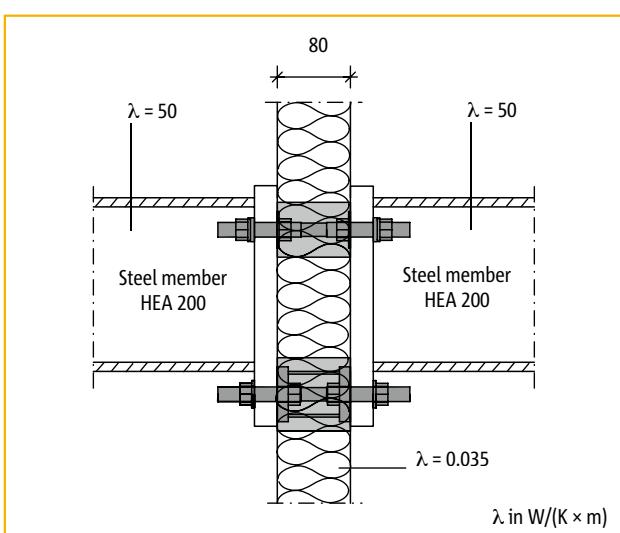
Connection of steel member HEA 200 with Schöck Isokorb® type KST16
